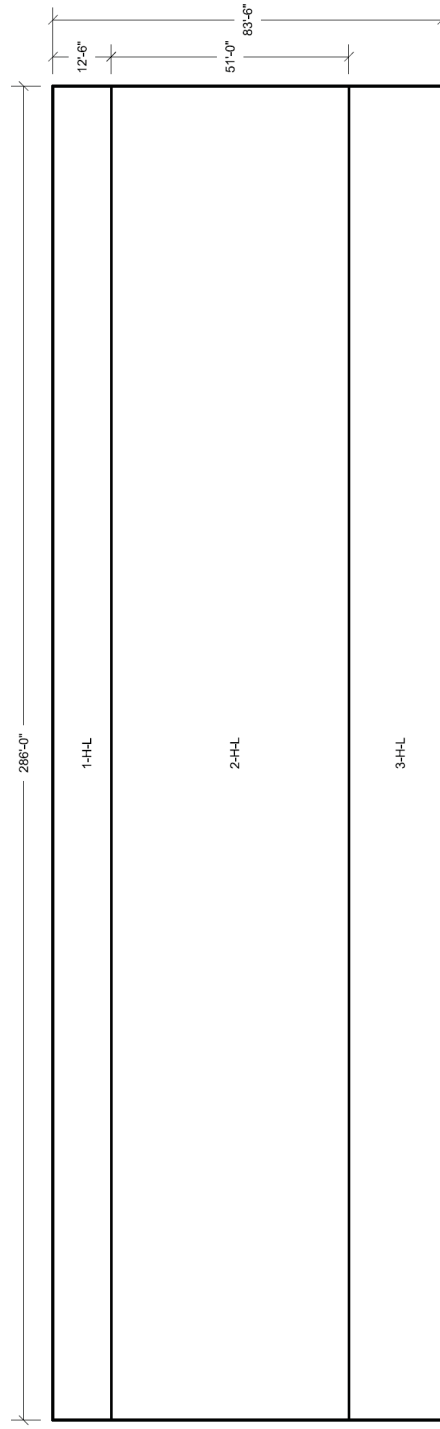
H.6-82: UHS BASIN NORTH WALL LOOKING SOUTH
